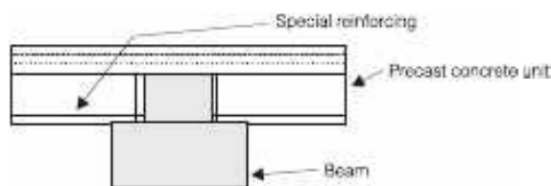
Alternate continuous reinforcement through the beam at the level of bottom of floor to support precast concrete floor units.
